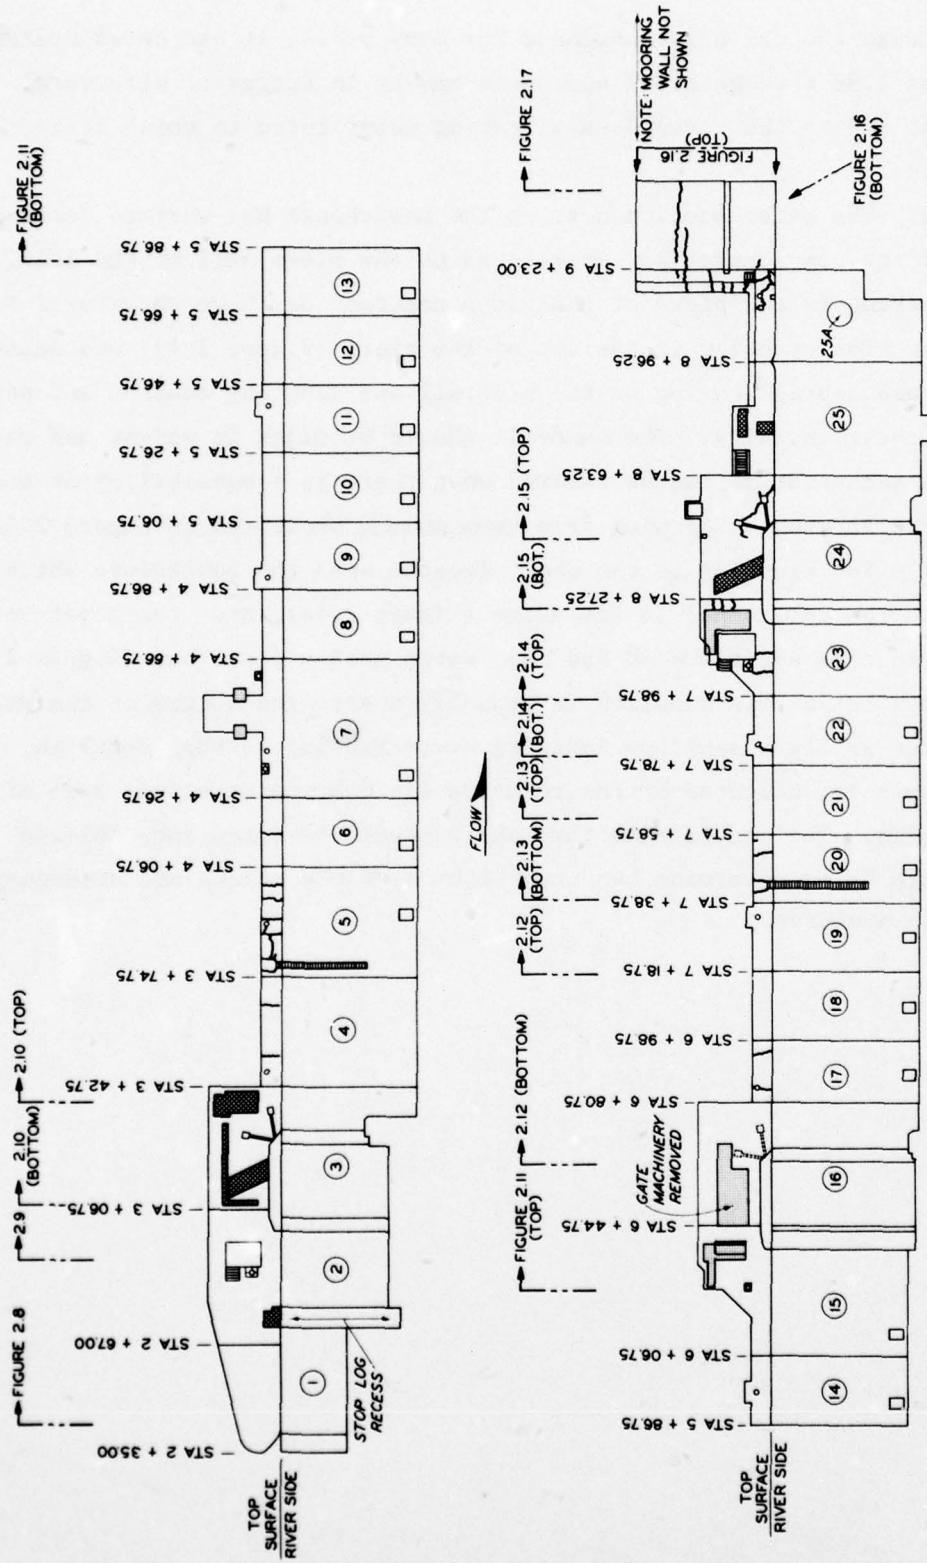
Surface cracks, landwall, Troy Lock and Dam, Troy, New York.
